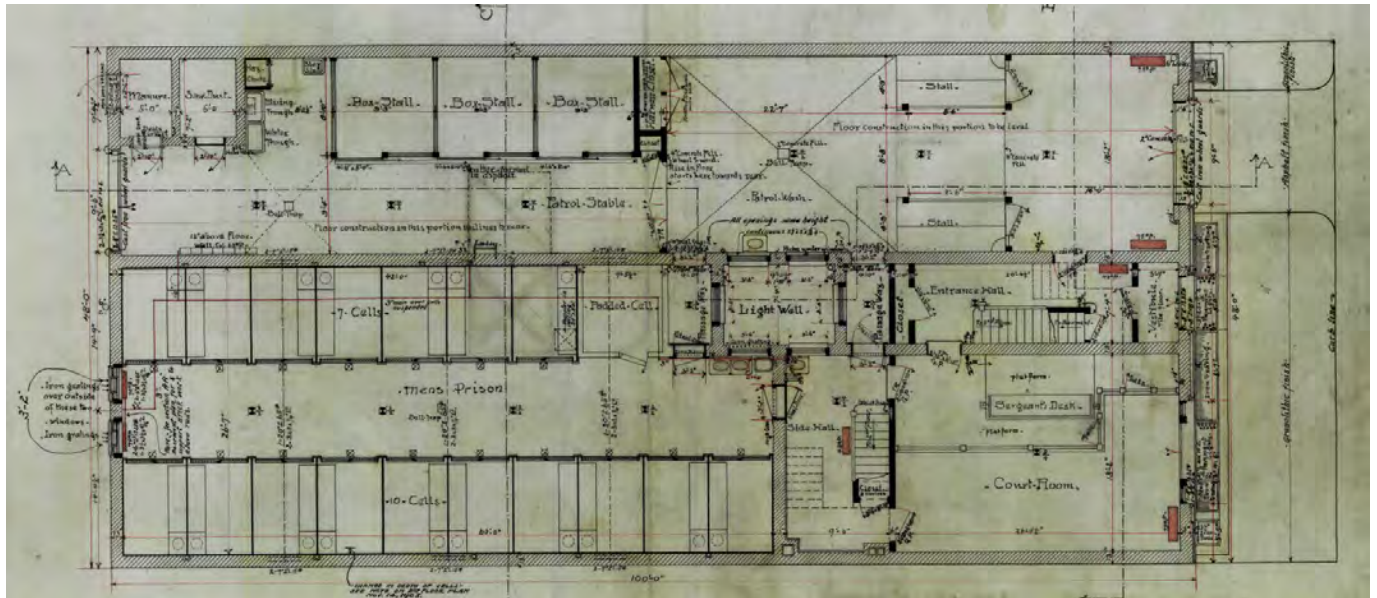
Stotz's 1908 floor plan layout for the main street-level, showing a large stable to the right, and court room and holding cells to the left and rear. Note the interior light well. (Courtesy Stotz Archives, MCF Architecture).
